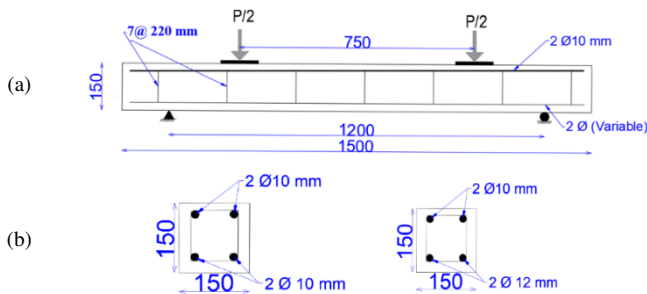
Reinforcement details for: (a) As_1 , (b) As_2 (all dimensions in mm).
